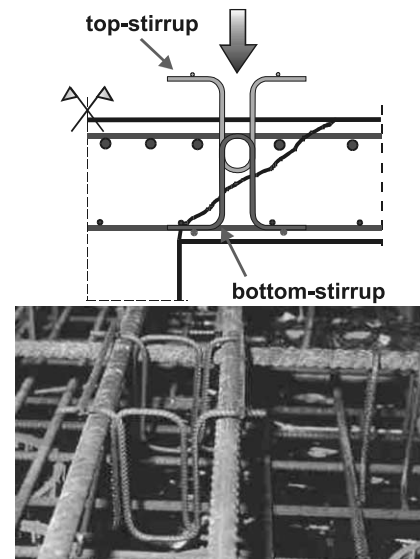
Type III: stirrups made of fabric reinforcement with a vertical splice and enclosing one direction of the top and bottom flexural reinforcement.
